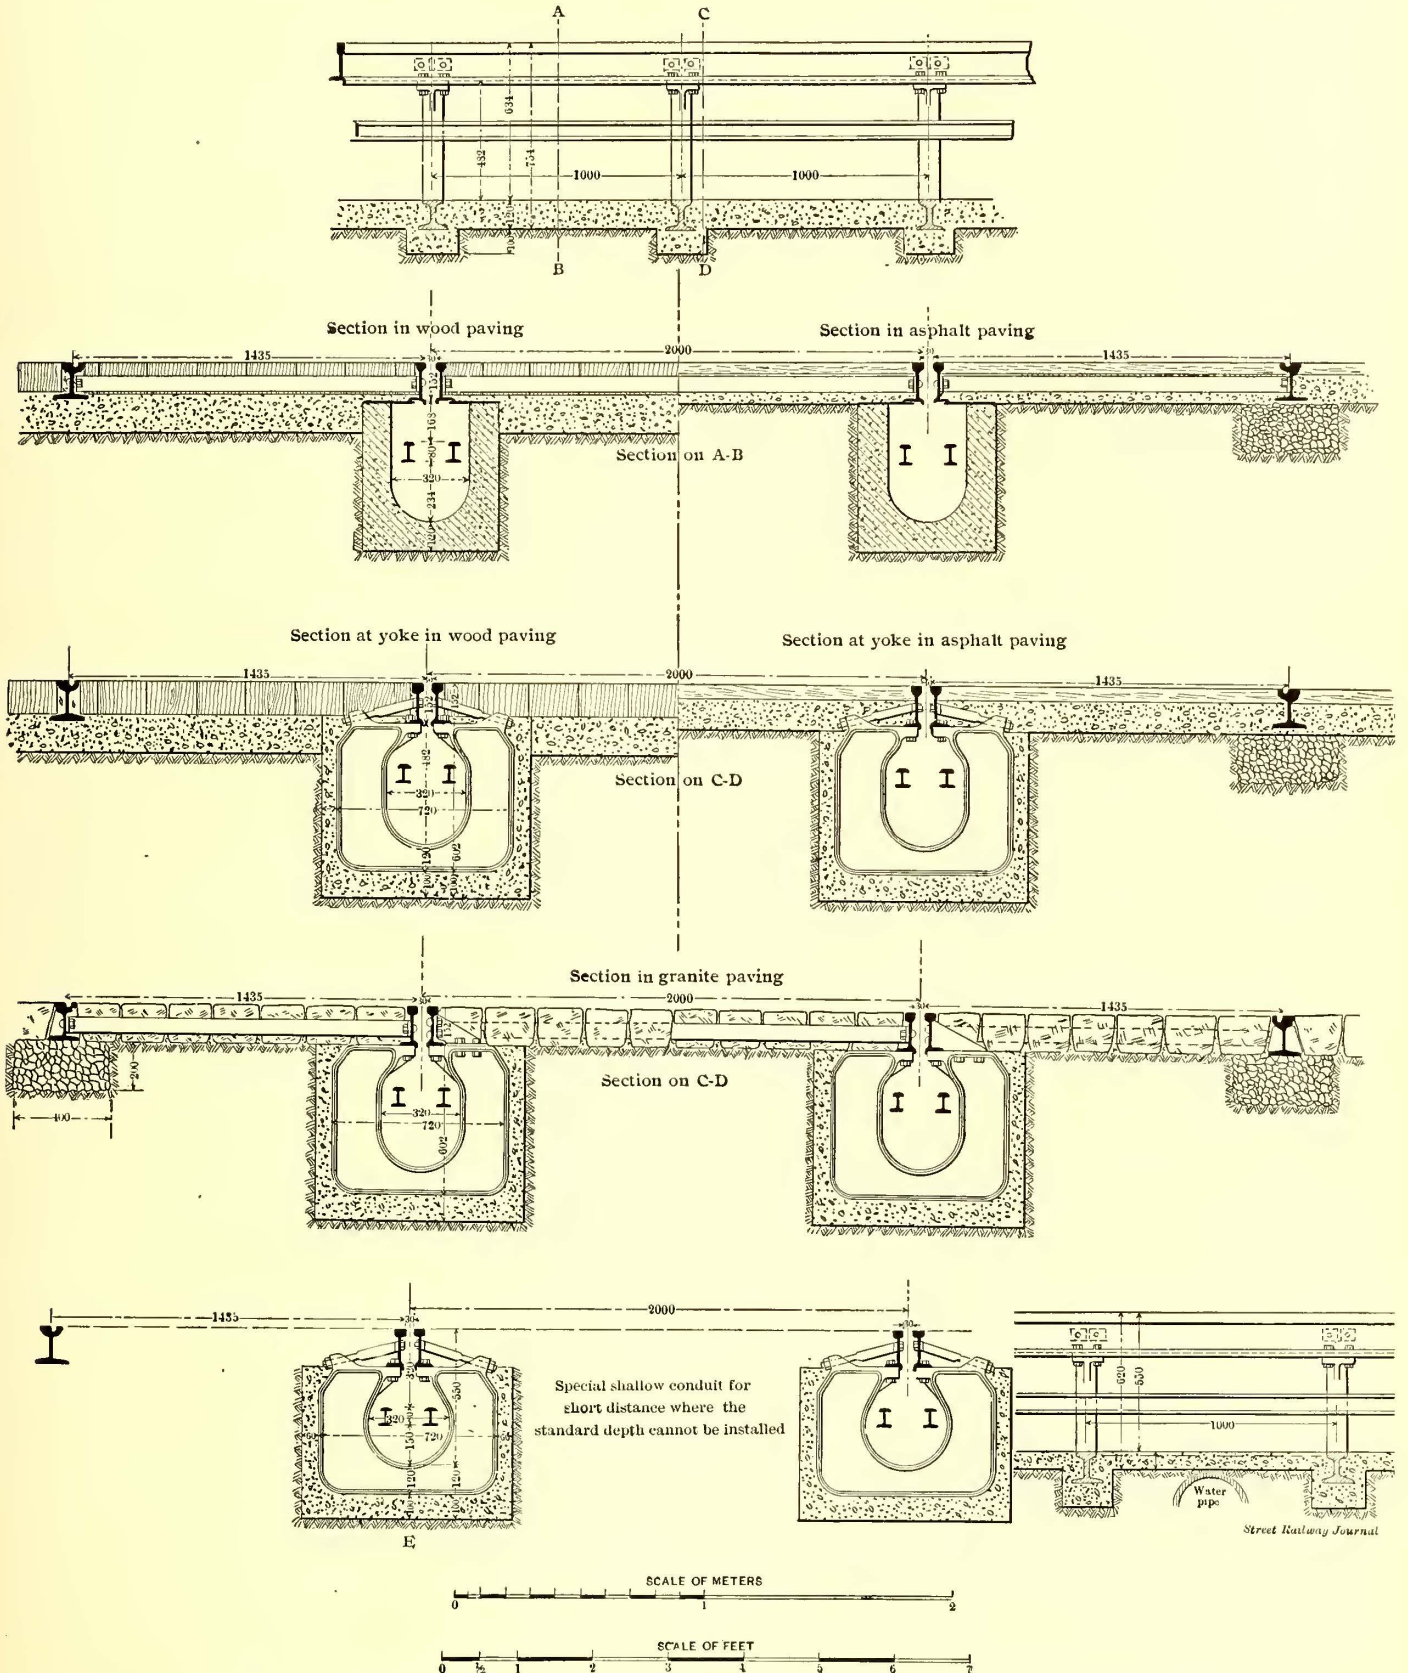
SECTIONS SHOWING STANDARD CONDUIT CONSTRUCTION USED IN BRUSSELS
